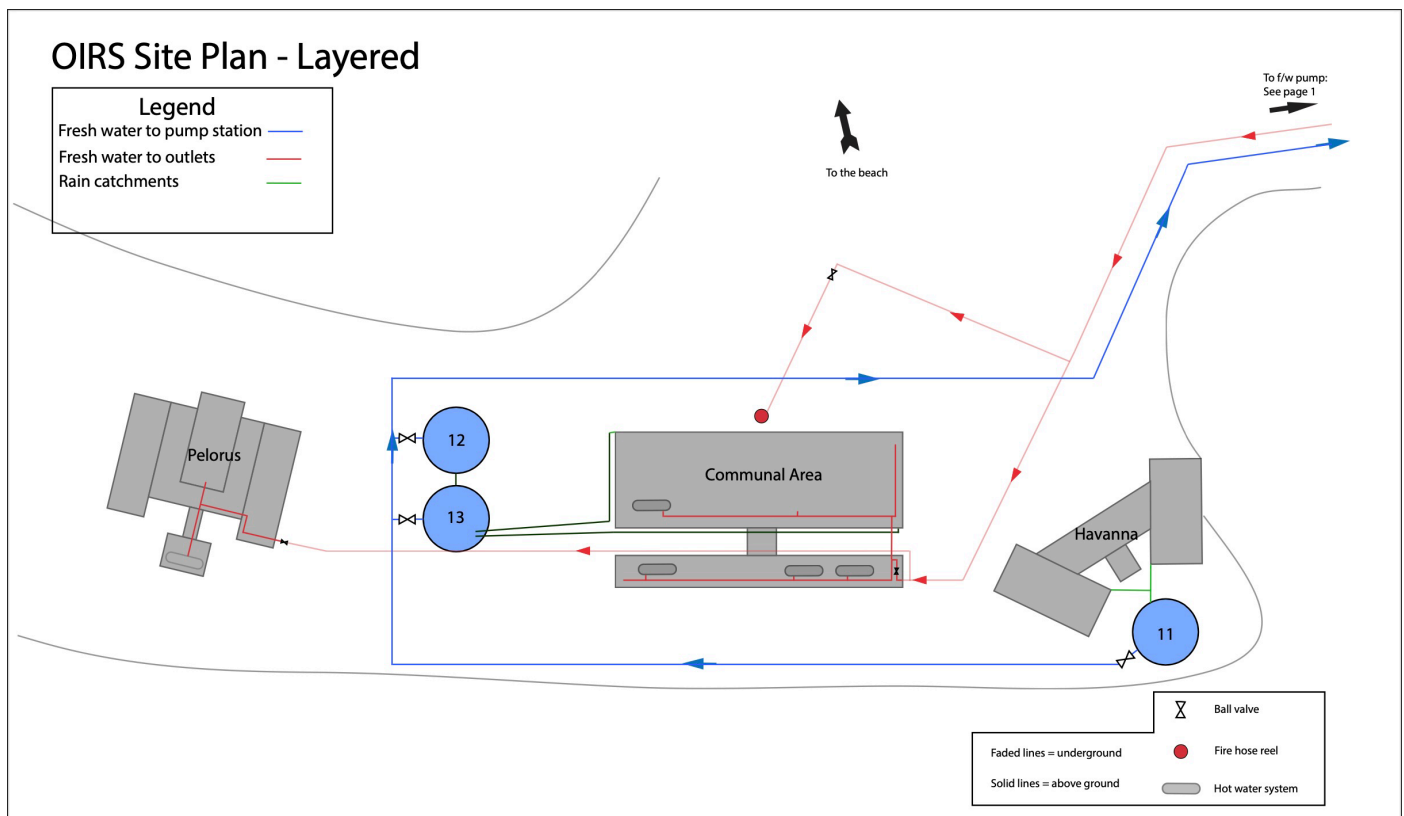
OIRS Site Plan – Freshwater - Southern Section
